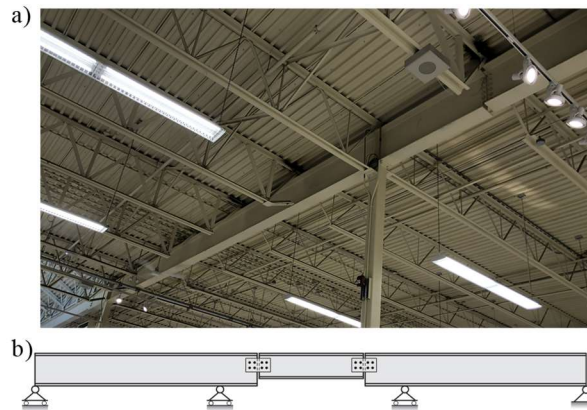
a) Steel-framed roof of a retail store in Edmonton, Canada; b) Typical cantilever-suspended-span construction.
